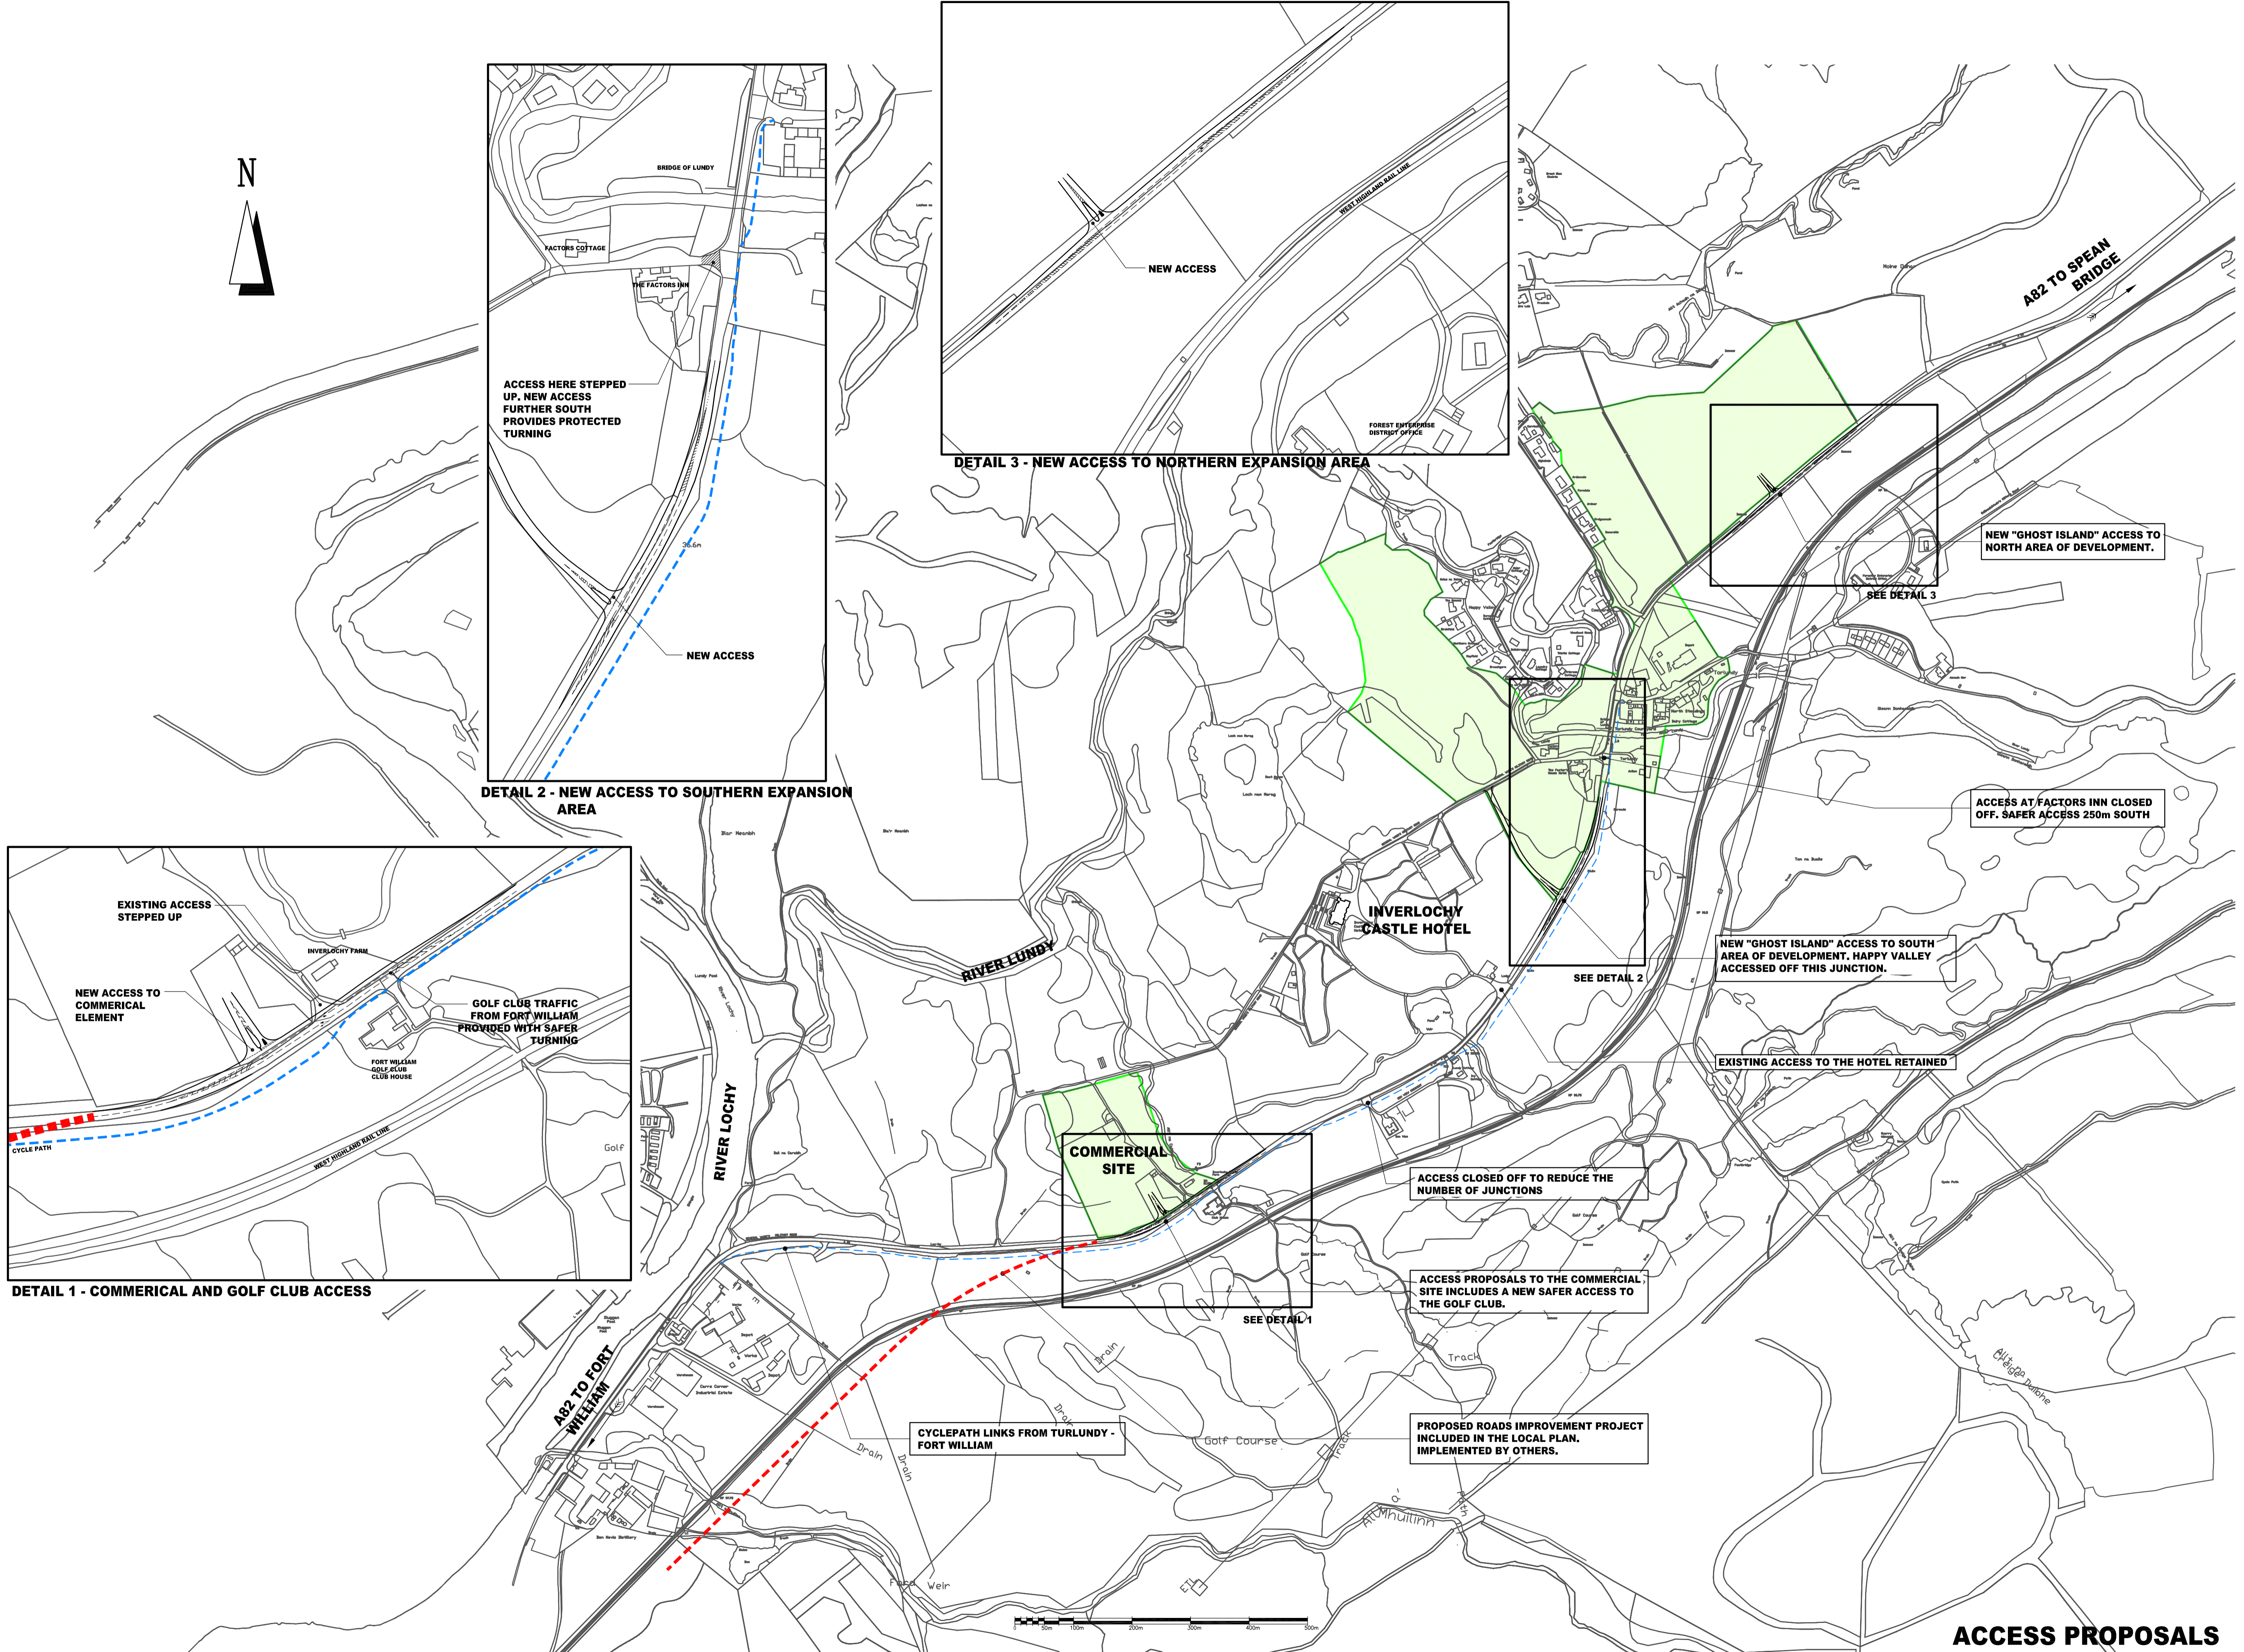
NEW ACCESS TO SOUTHERN EXPANSION AREA
